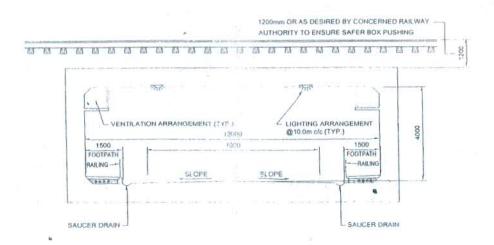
Typical Cross Section for Railway Portion-Precast Box (Type-5)
